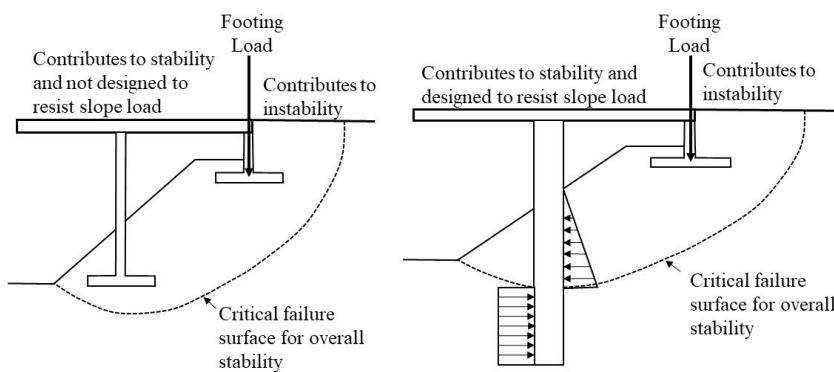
Examples Illustrating when Foundation Elements Contribute to Instability or to Stability of the Slope
